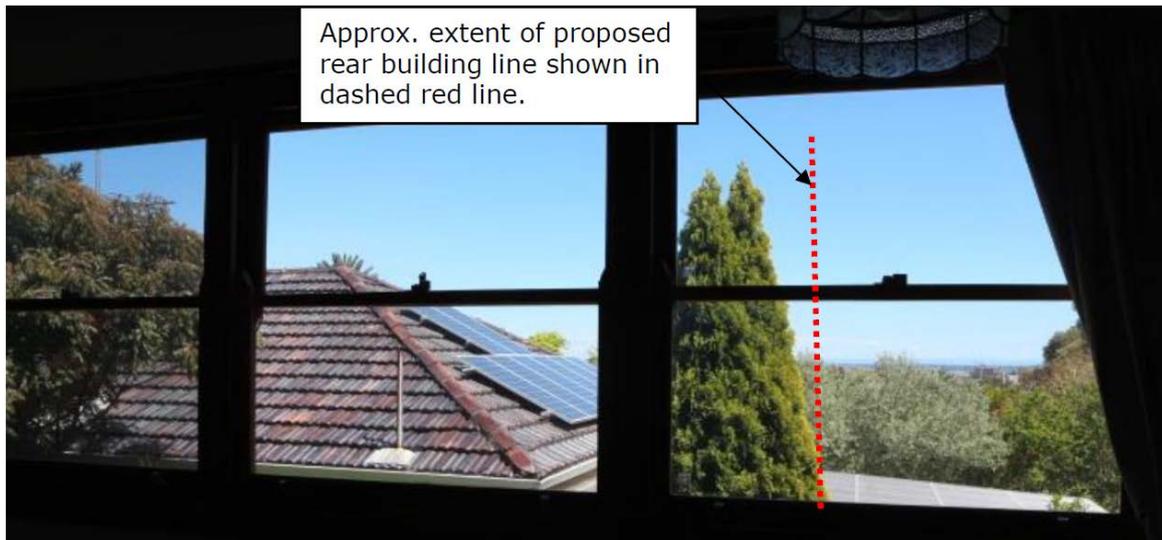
View looking due west to the subject site from the ground floor rear living area at no. 6 Kennedy Street. (Photo taken by Solution Zane)
